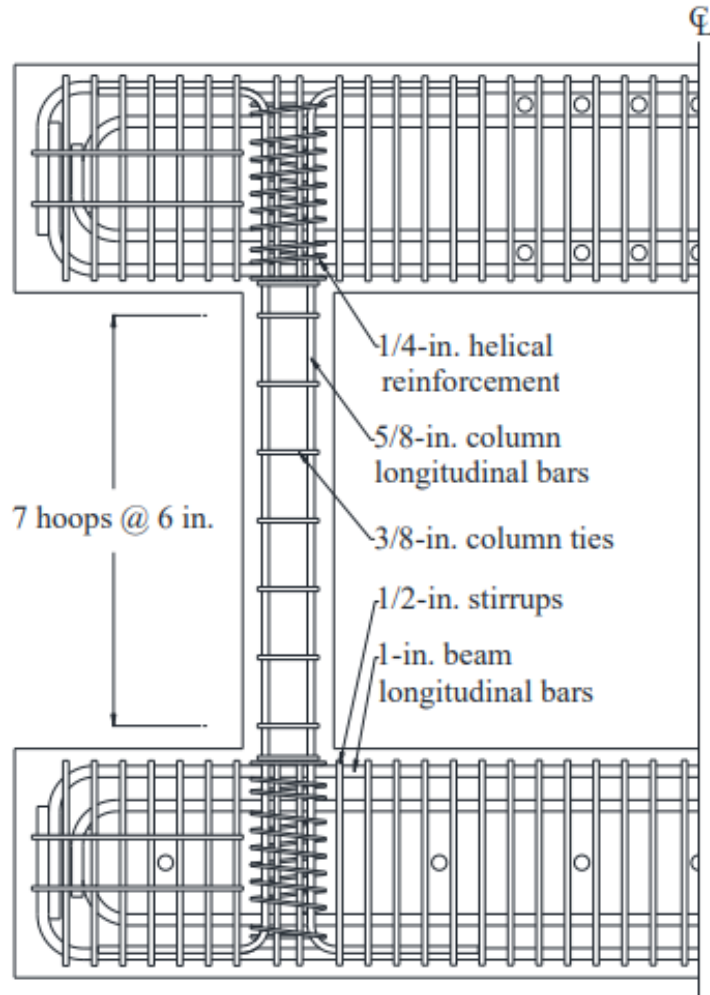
Reinforcement Layout (Monical, 2022, Figure B-6)
